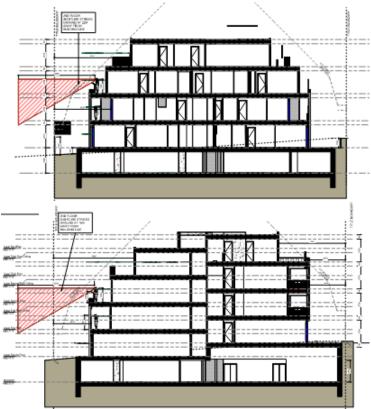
Sectional diagram demonstrating overlooking measures from second floor terrace, toward the west
